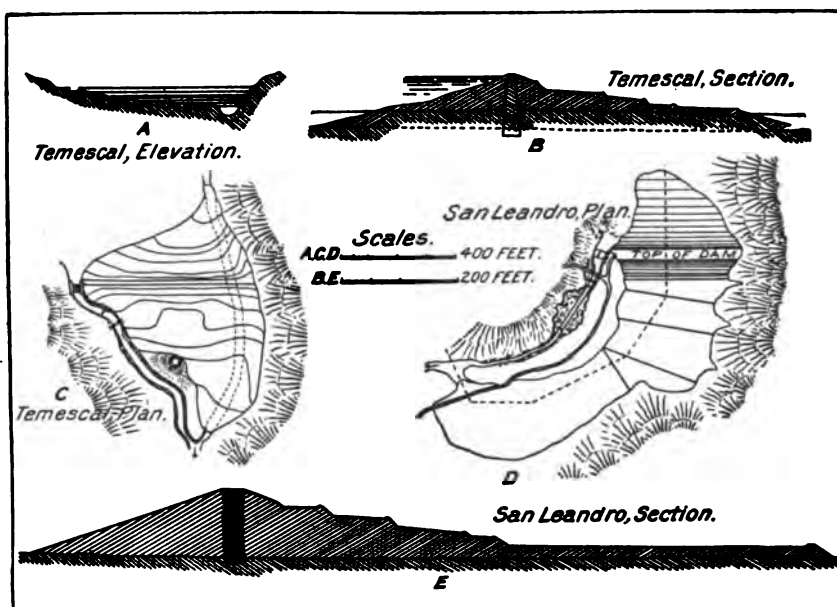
PLANS AND CROSS-SECTIONS OF SAN LEANDRO AND TEMESCAL DAMS.
